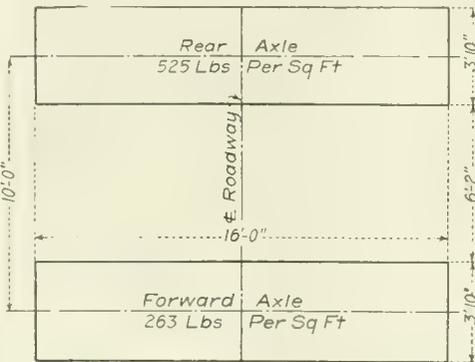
Diagram Showing Concentrated Live Load Used in the Design of Highway Bridges by Illinois State Highway Commission.
